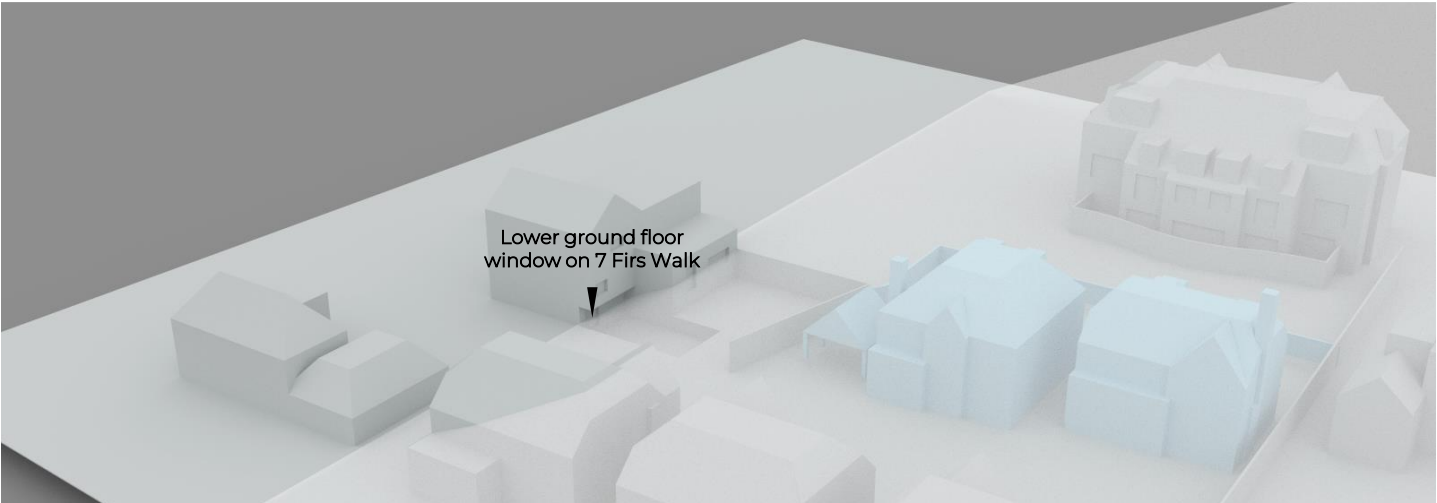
25-degree line test for lower ground floor window of 7 Firs Walk.
